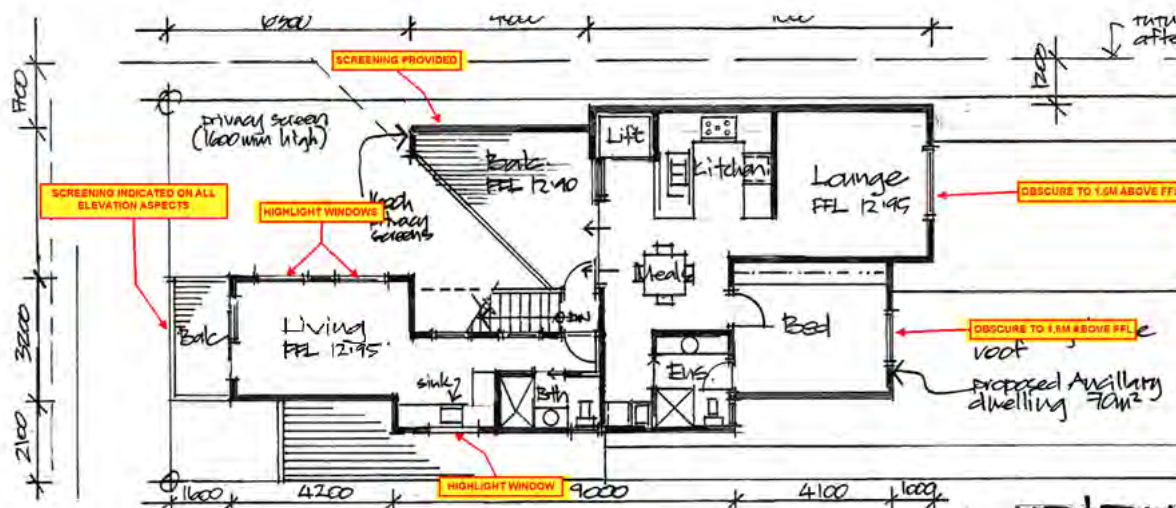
Illustration of upper floor windows and the proposed method of screening.
